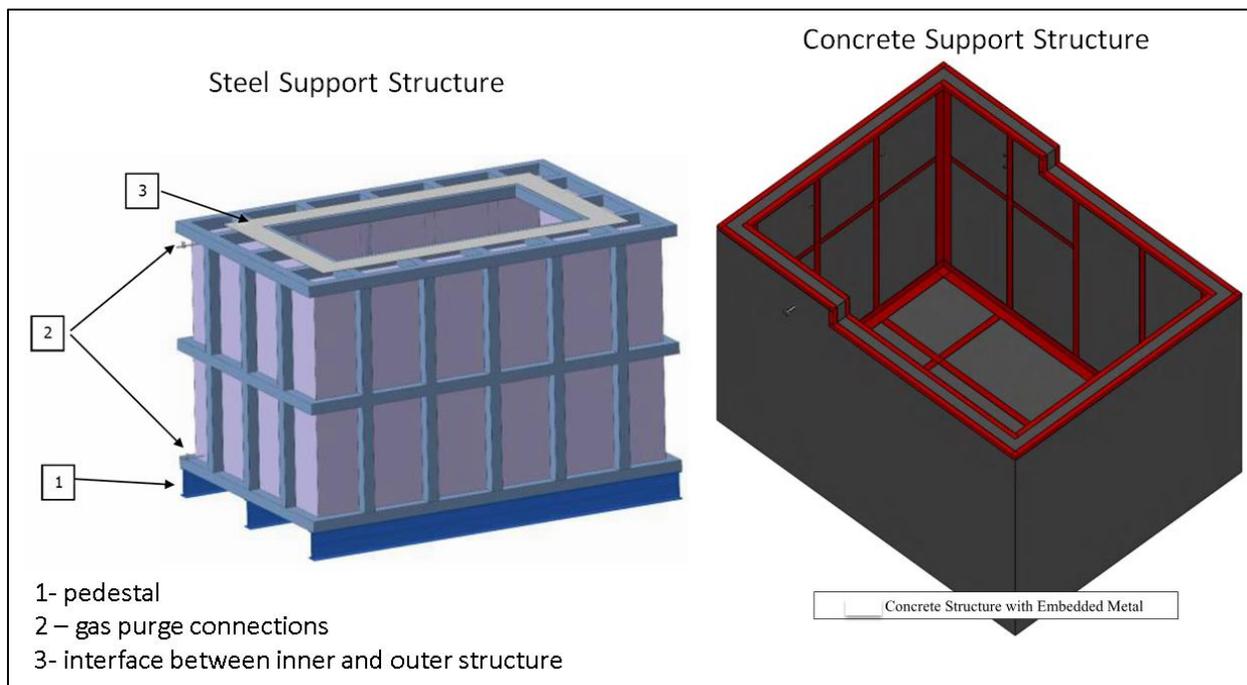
Examples of steel support structure (left) and concrete support structure (right).
